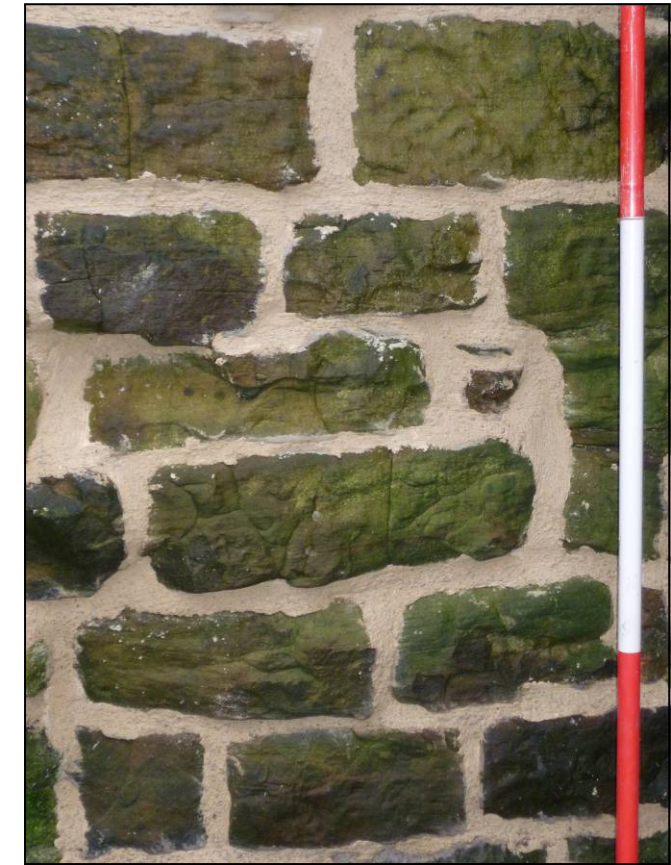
Area 3 dam wall, detail of repointing, looking S (photo 4/676).
